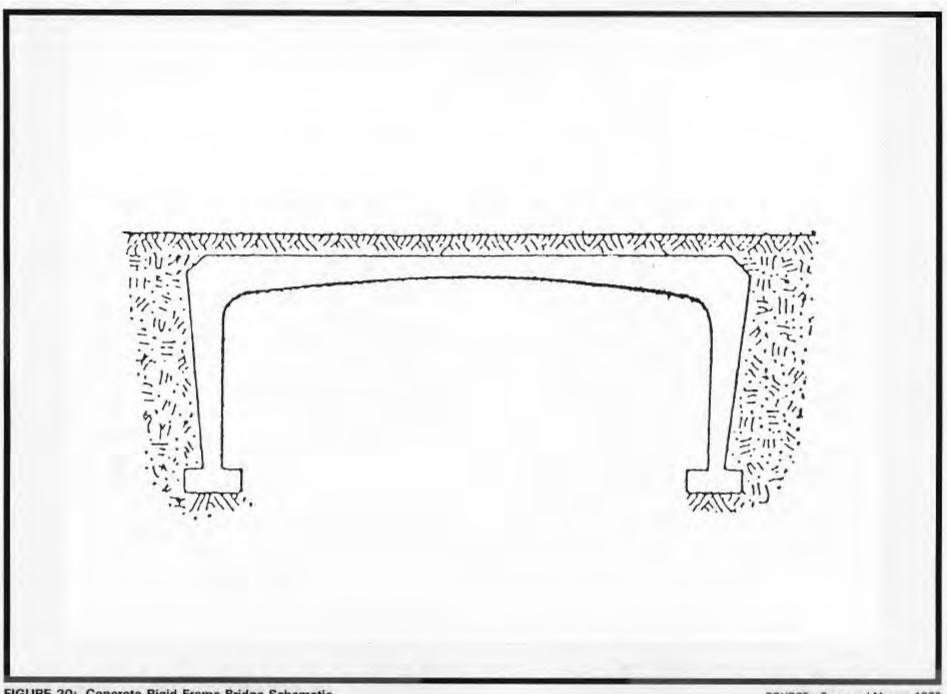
Concrete Rigid Frame Bridge Schematic
